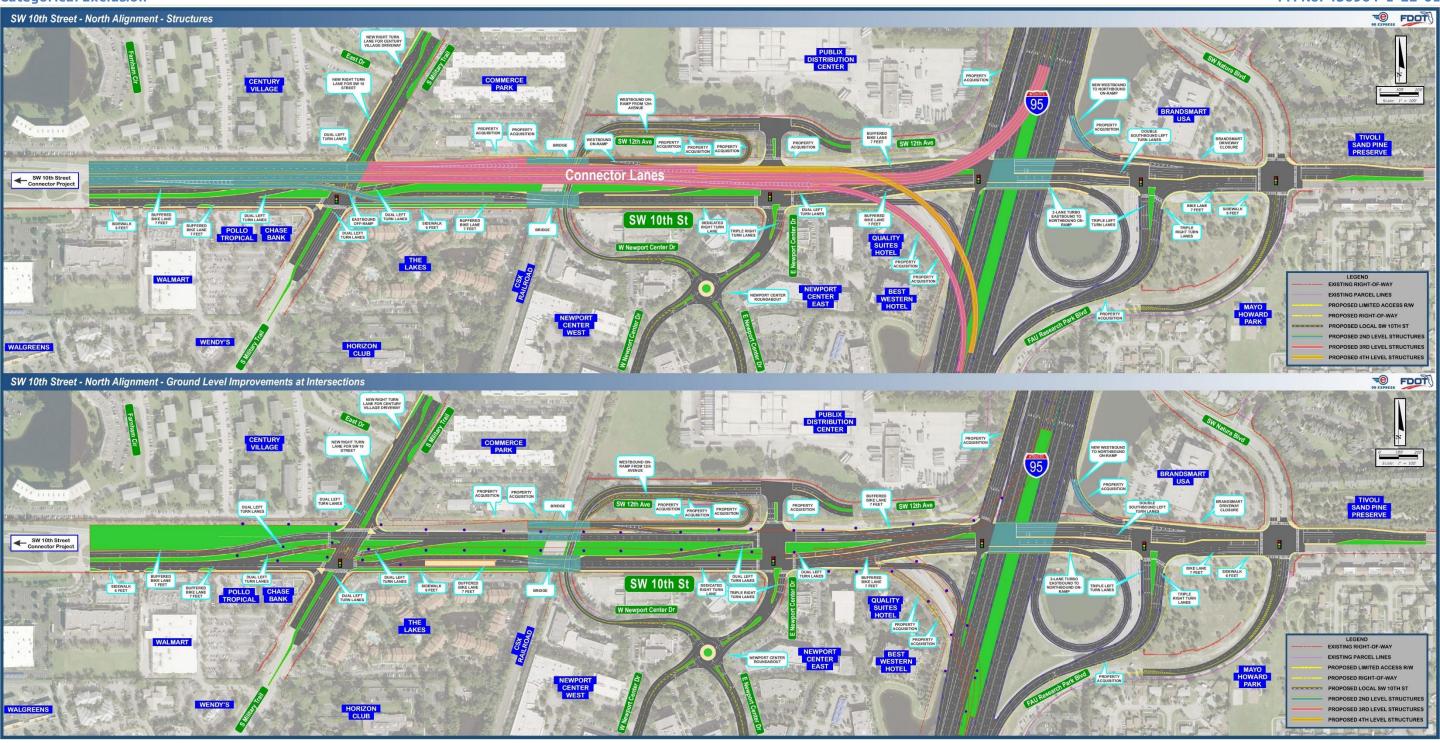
10: SW 10th Street - North Alignment Concept Plan
